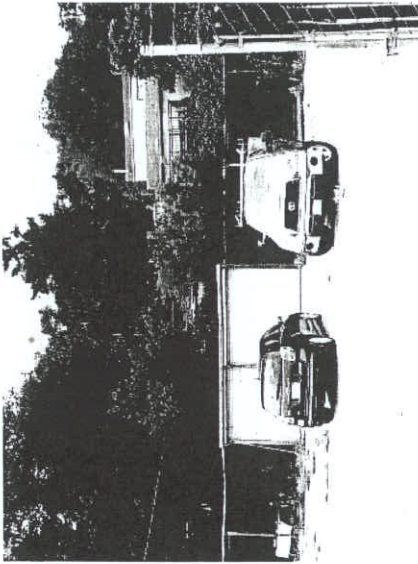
View from property entrance on Bayshore, facing west. Proposed project would be built in pictured contractor's yard and garage.
